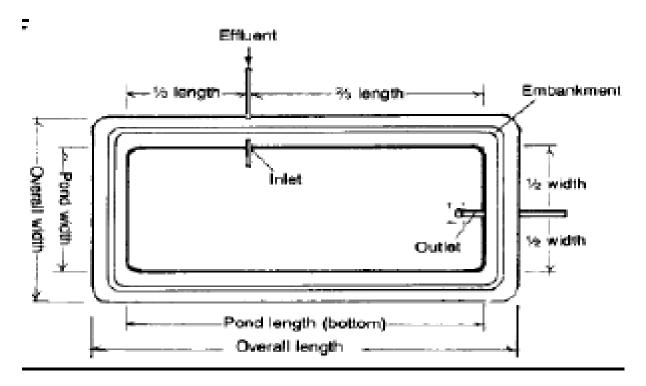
(A): Inlet and Outlet of an Oxidation pond
